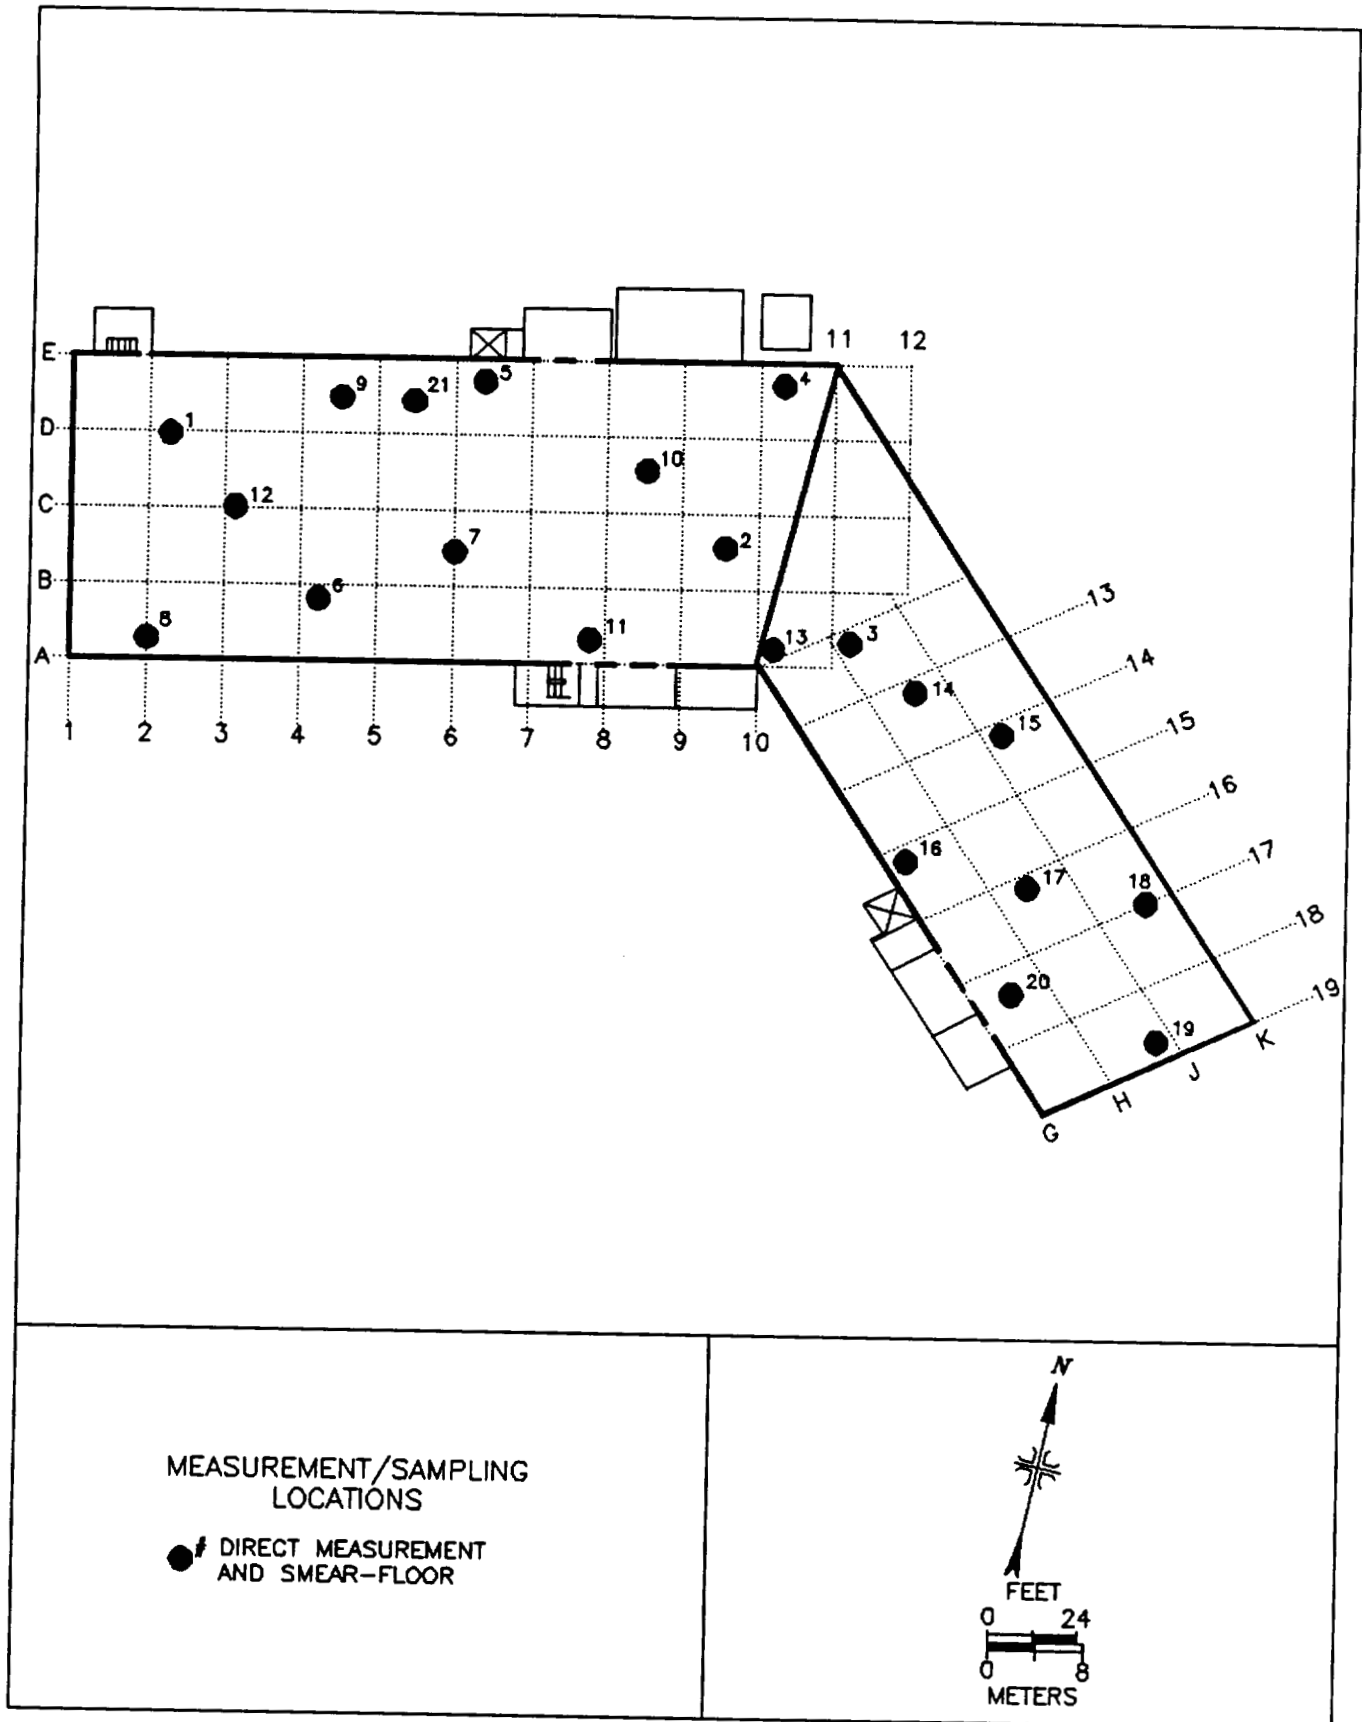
Building 8, First Floor – Measurement and Sampling Locations
